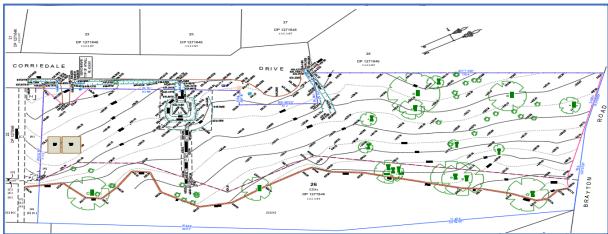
Survey Plan - No. 84 Corriedale Drive Marulan 2579
